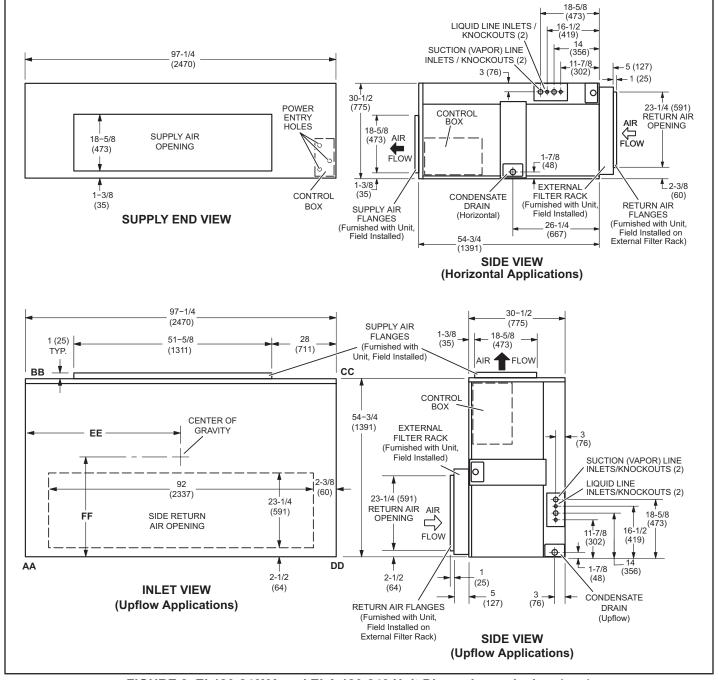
EL180-240XA and ELA 180-240 Unit Dimensions - inches (mm)
